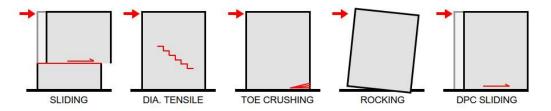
In-plane failure mechanisms of masonry piers
